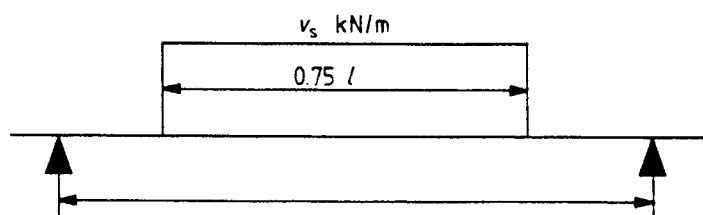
Distribution of load on a beam supporting a two-way spanning slab
